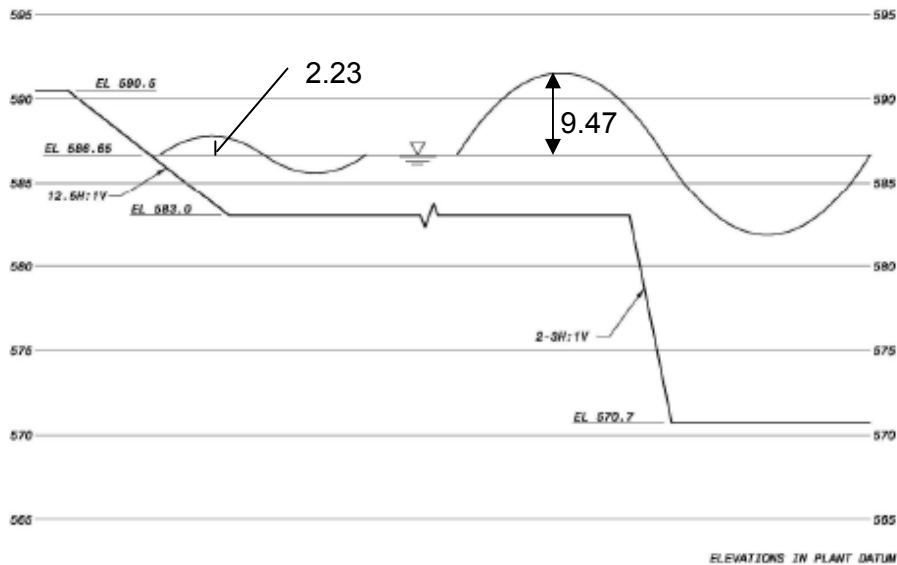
Characteristics of Breaking Waves at the Toes of the Seawall and Berm (Vertical Exaggeration, ~10:1; Elevation in Plant Datum).
